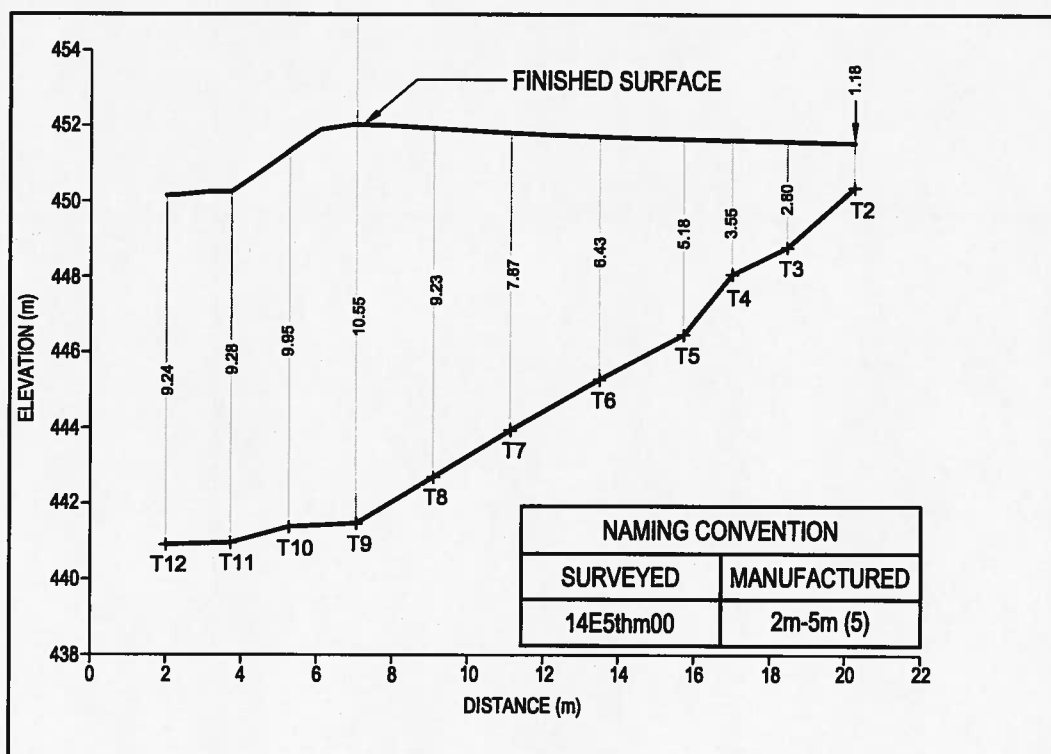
14E5thm00 (2m-5m (5)) - AS MANUFACTURED, PLAN, AND SECTION
